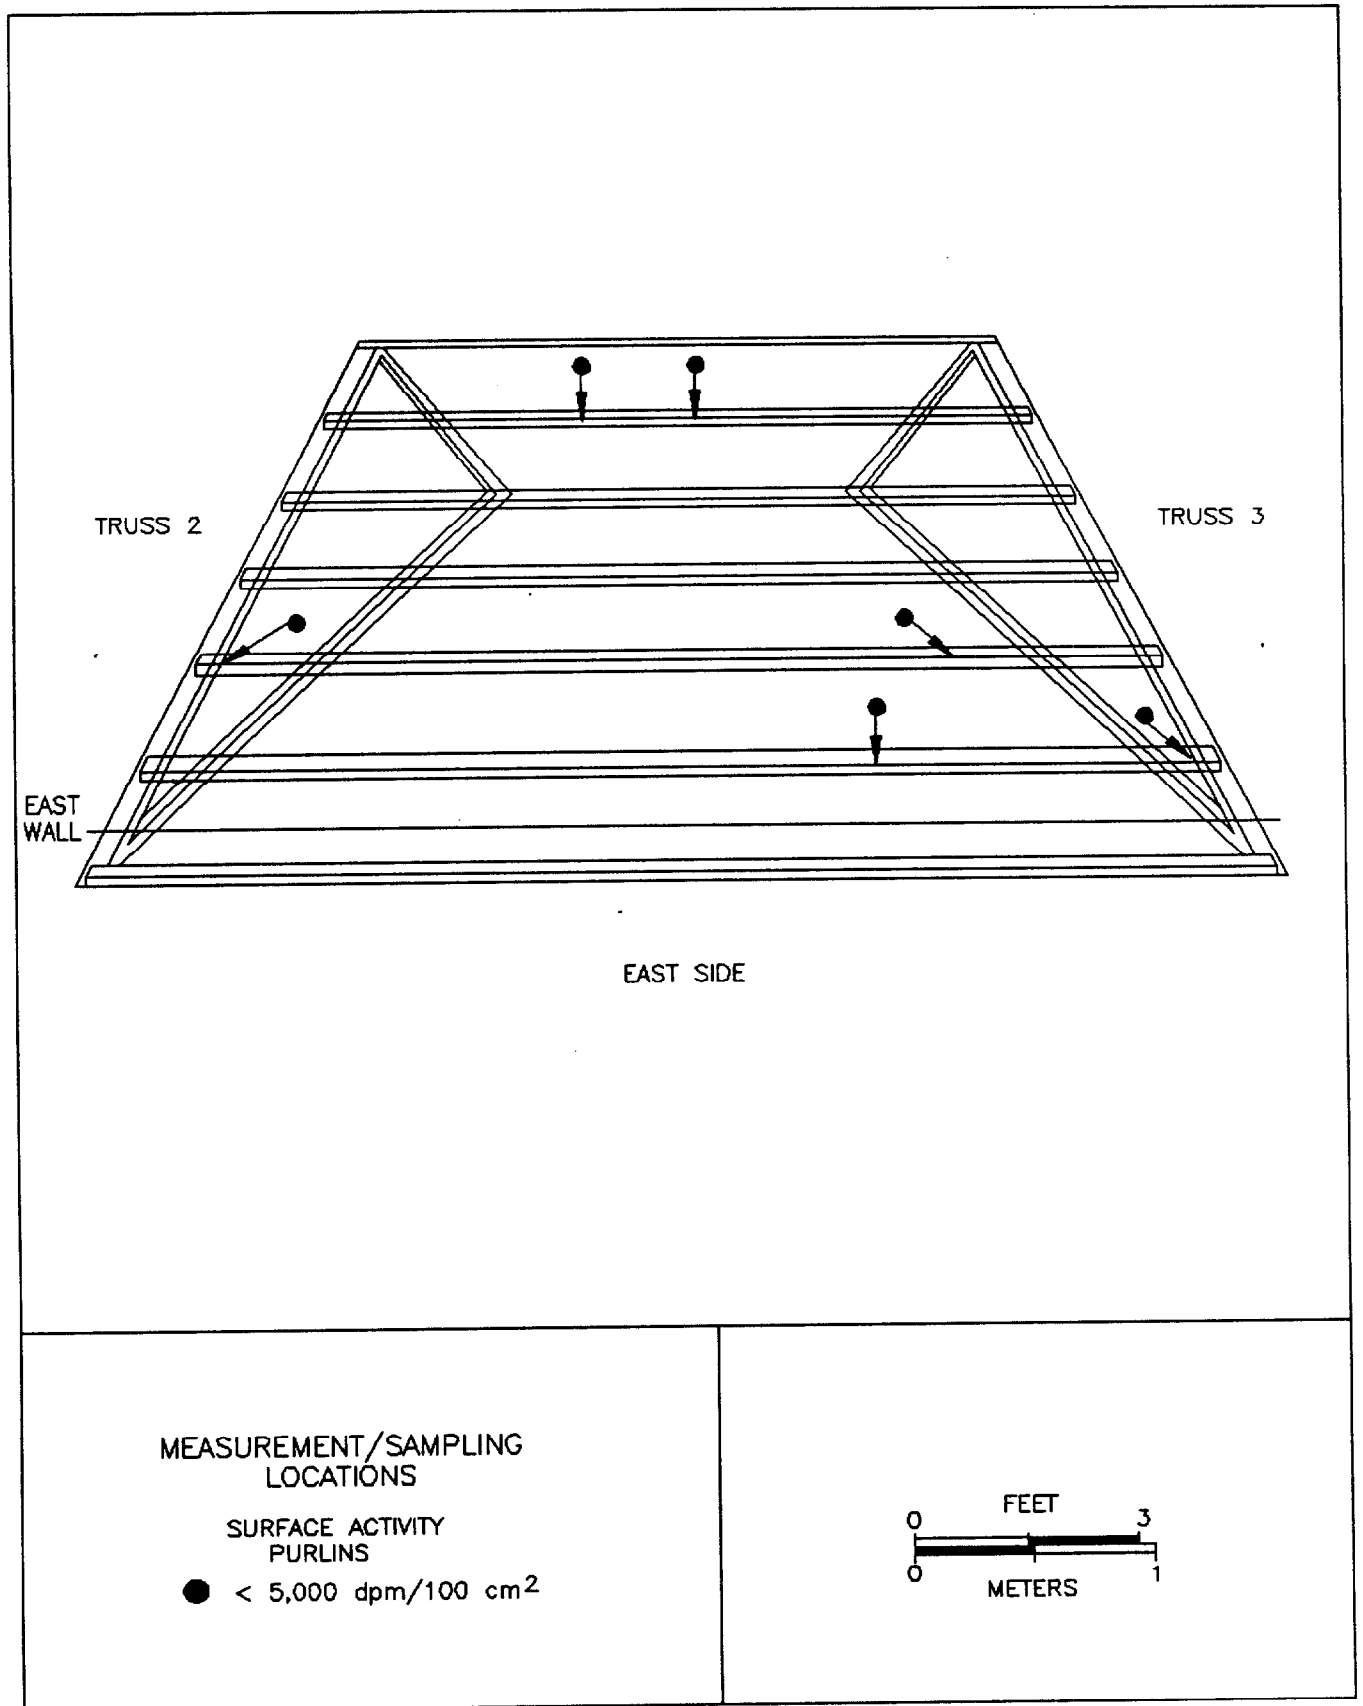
Building 8, Bay 2, East – Measurement and Sampling Locations
